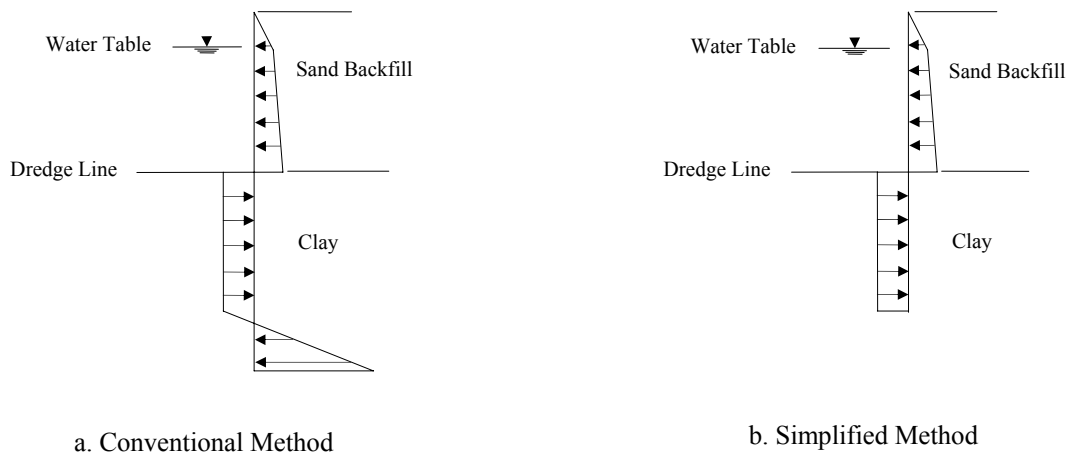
Design lateral forces for a cantilevered sheet pile [A4]
